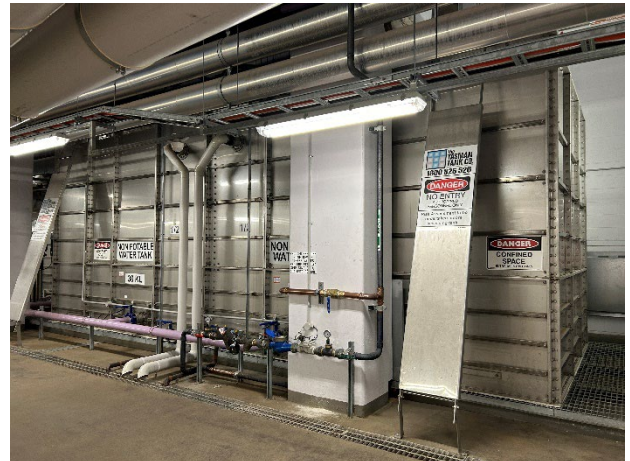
Level 1, Dalley Street, Water Tank Room – non-potable water tank (F).
